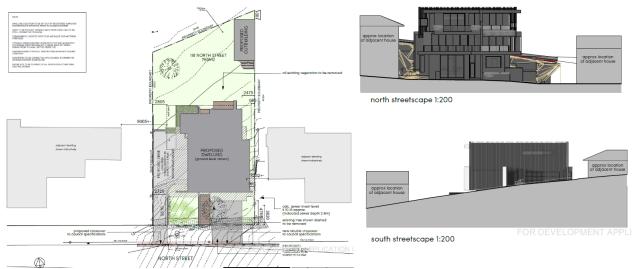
Proposed single dwelling development plans – 116-118 North Street, Devonport – CT73838/34 (Source: DCC – PA2017.0084).
